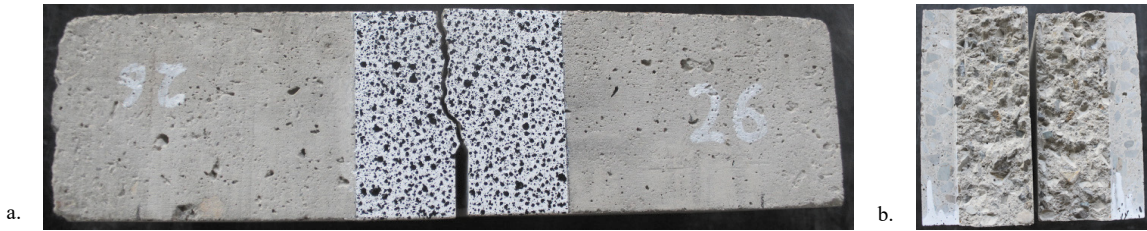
Specimen FM_75_150_210_D_2 at failure: side view (a) and surfaces of the fracture (b).
